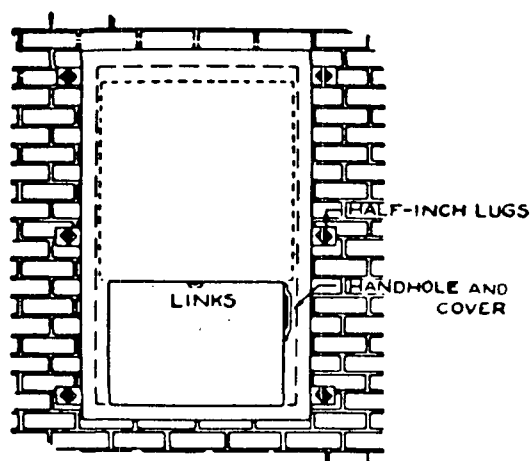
Suggested type of vertical fire door for duct passing through opening in fire wall.
